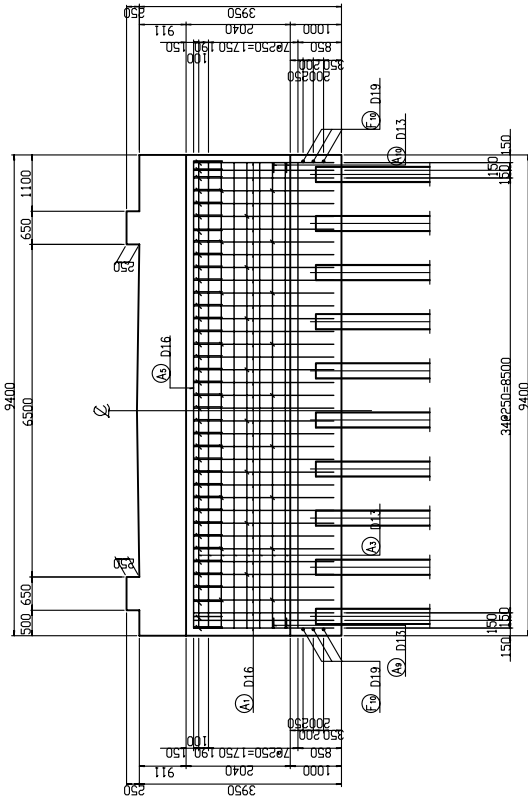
DETAILS OF SUPPORT ANCHOR SCALE 1:20
